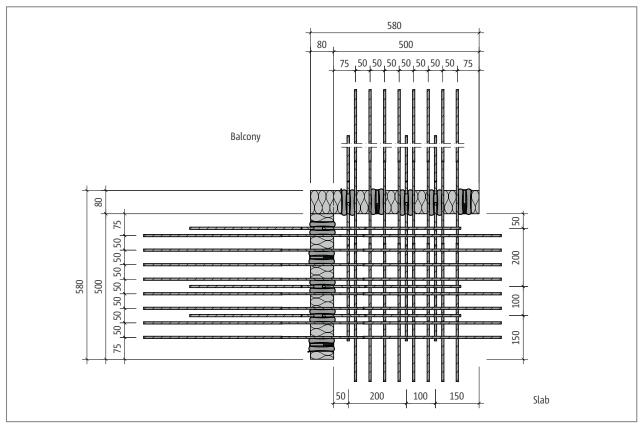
Schöck Isokorb® T type C-M1: Product layout
